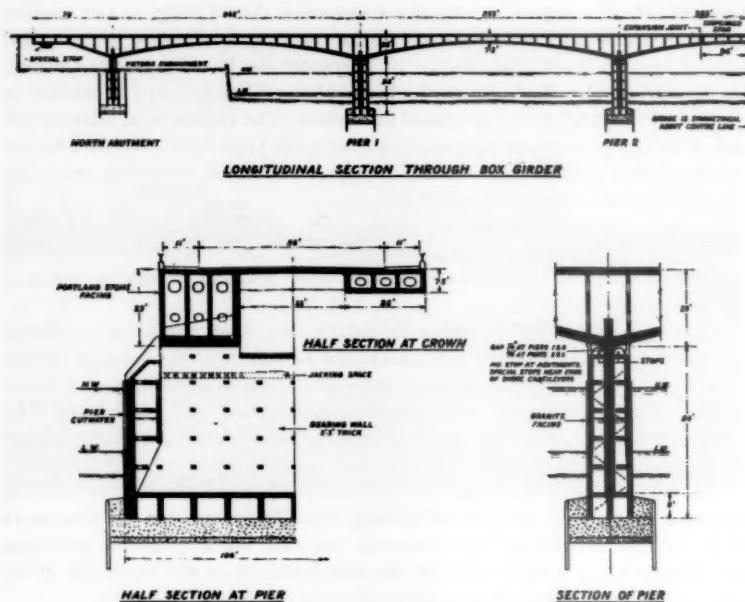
New Waterloo Bridge—cross-section of the design
